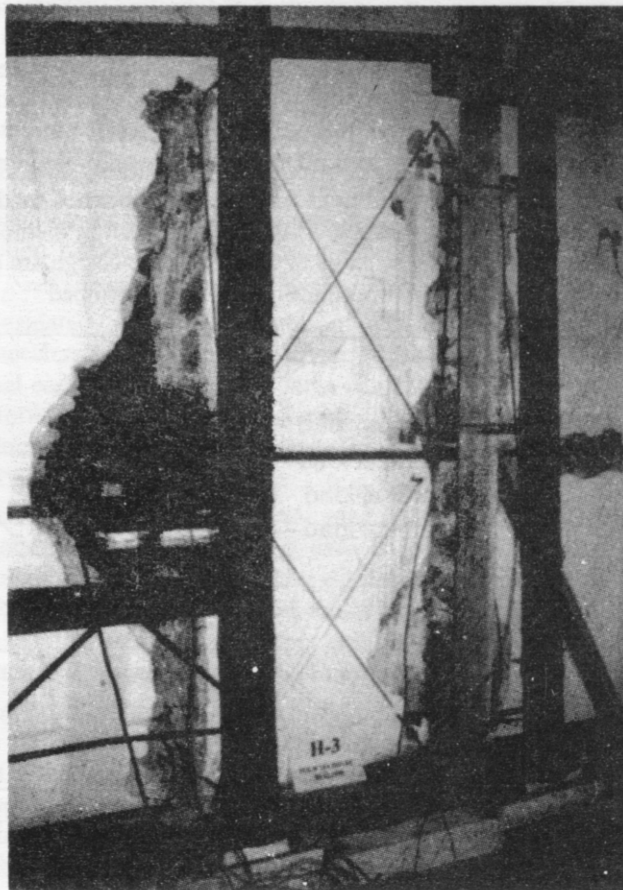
Typical arrangement of an in-situ test of an existing stone-masonry wall
